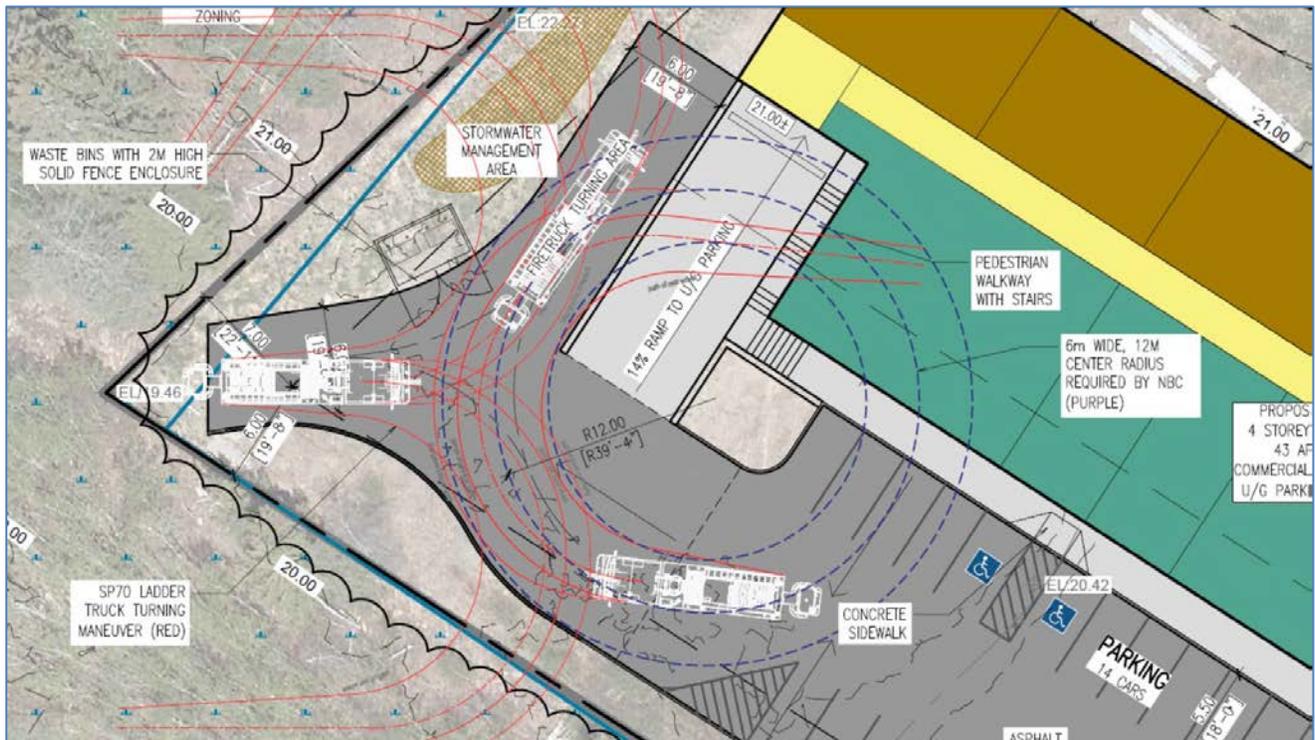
Revised Site plan with Turning Area for Fire Trucks
